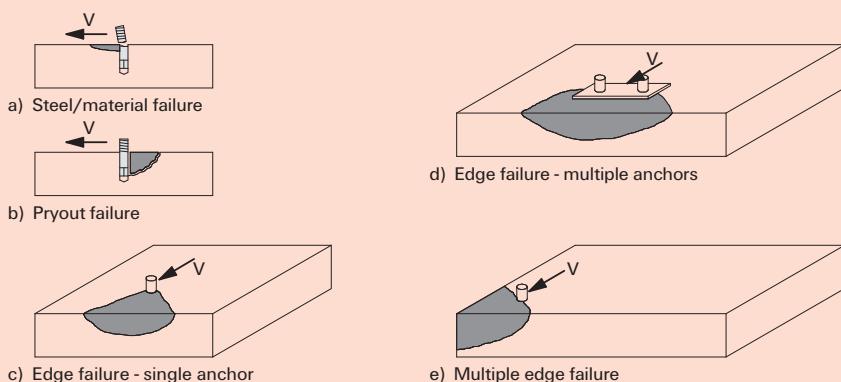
illustrates the possible modes of failure of anchors in concrete subjected to shear load.
